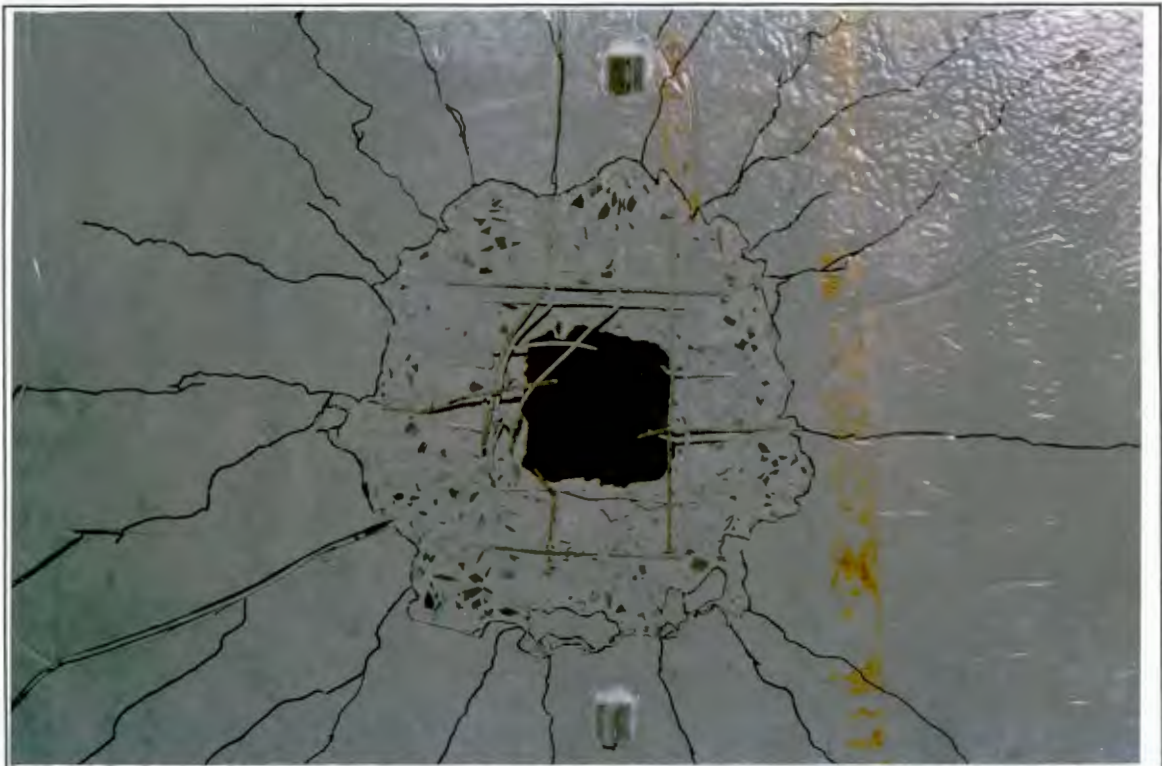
Photographic Plate 7.1 'JUST' FAILED IMPACTED PLAIN CONCRETE BEAM
